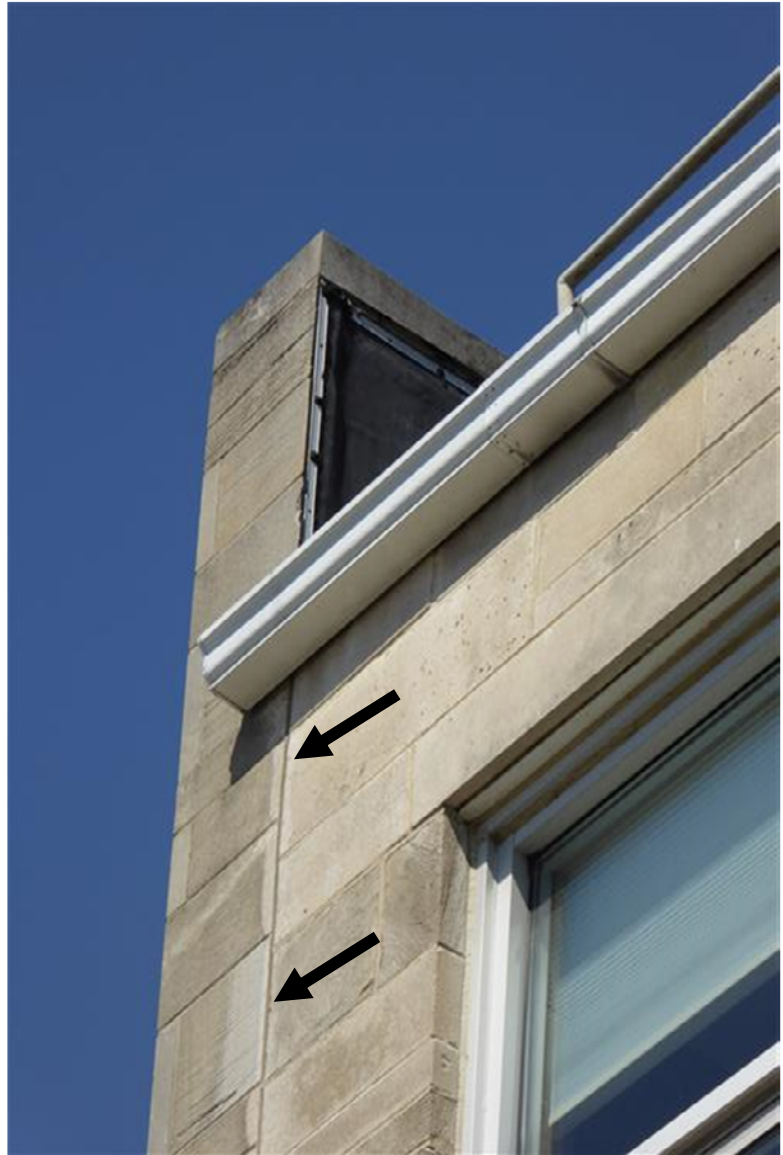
Looking south at the original west wing of the Kohr Building and the top of the stairwell/elevator tower.
